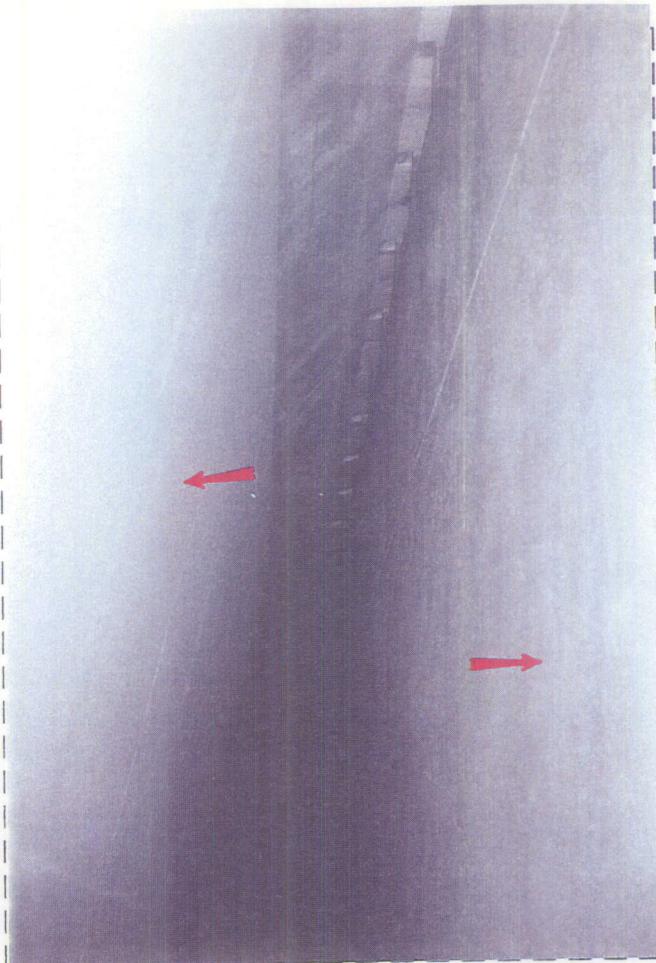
Morris Dam - 70' x 18' Drum Gate #2 - D/S of gate chamber. Left arrow point to concrete chamber wall, right arrow point to bottom faceplate. Top of picture is looks towards hinge assembly. - (9/10/98).
